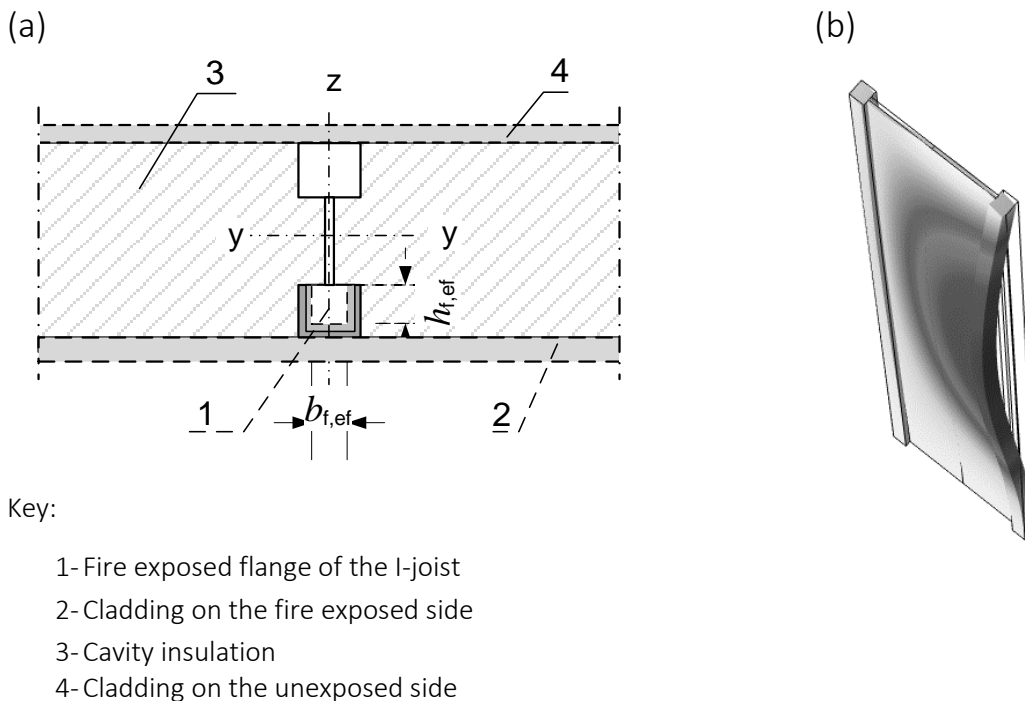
Timber frame assembly with I-joists exposed to fire. Cross-section (a) and the typical buckling mode after fall-off of cladding (b).
